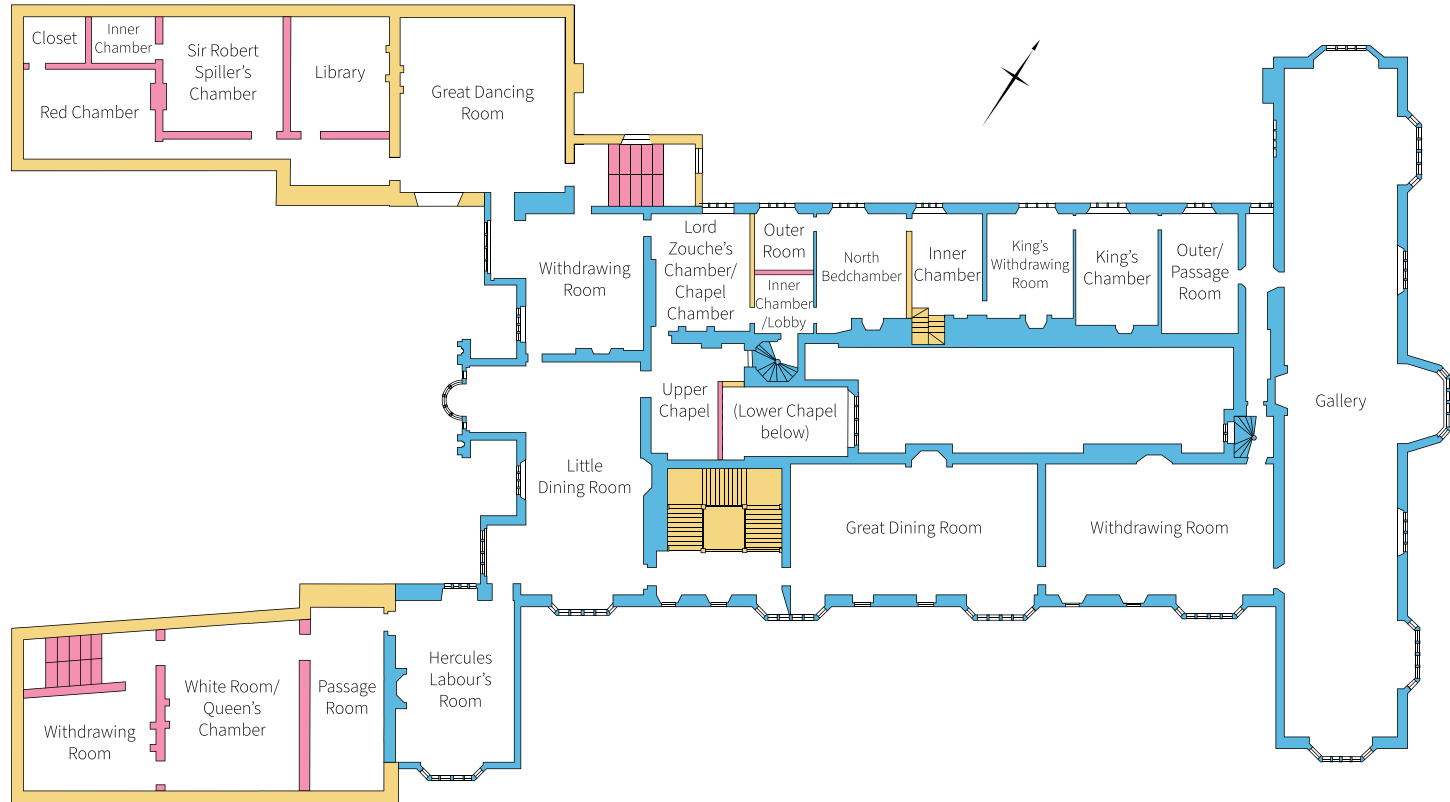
Conjectural reconstruction of the first-floor plan of Bramshill in the 1630s. *Plan:* © Historic England Archive, reproduced with permission.
